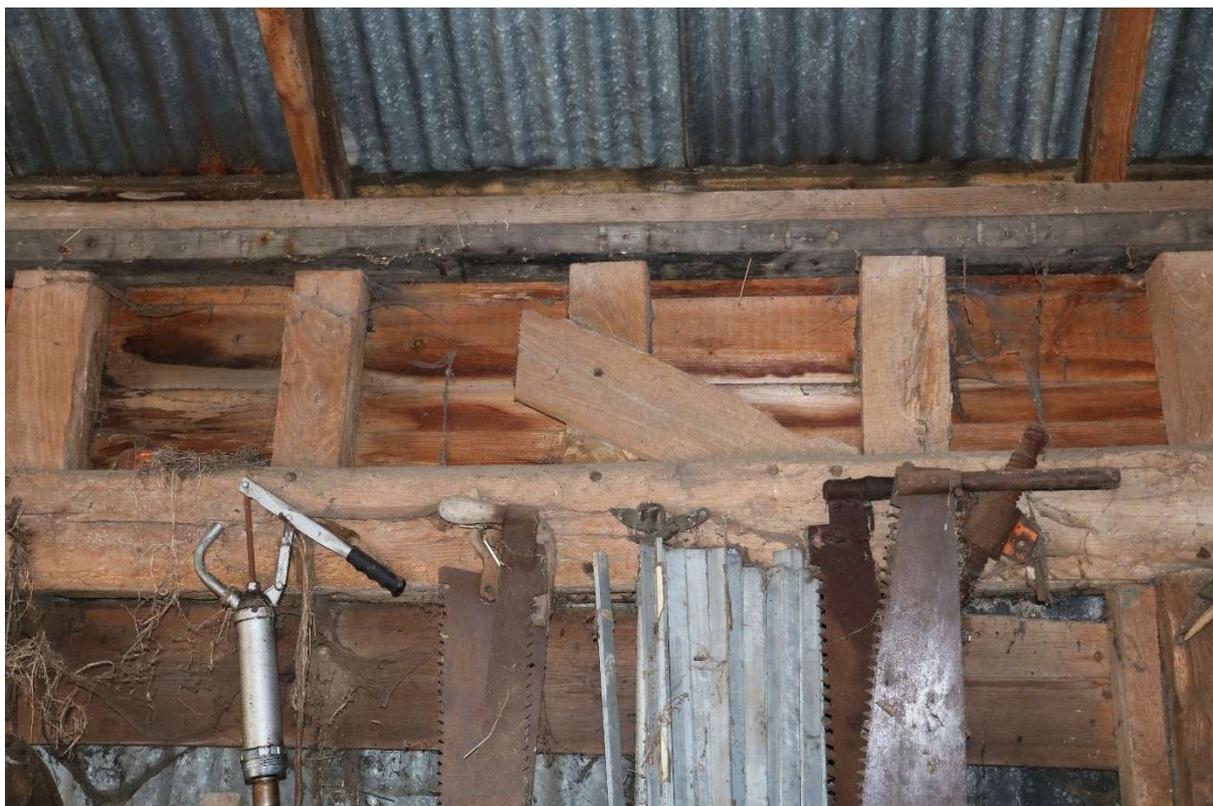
Detail of pegged studs in the north-eastern wall of bay 1 of threshing barn B. Photograph taken facing north-east.
